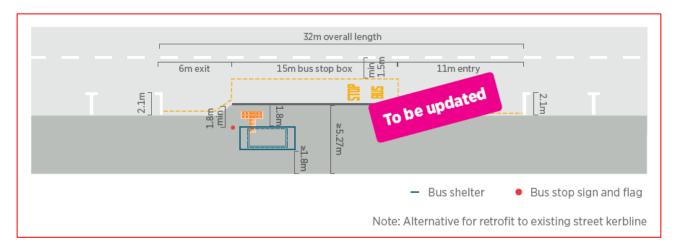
Half-width bus boarder – (Alternative 2) for retrofit to existing street kerbline
